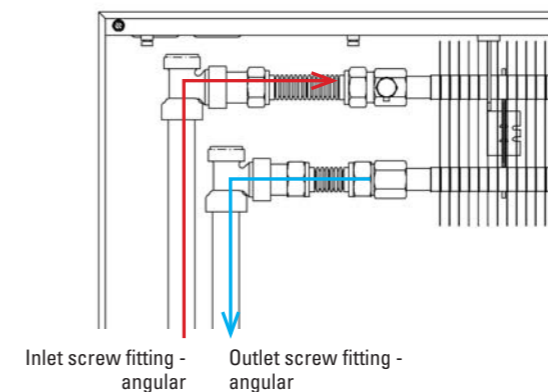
Side heating water connection - from the window (non-standard accessory - angular connection)
